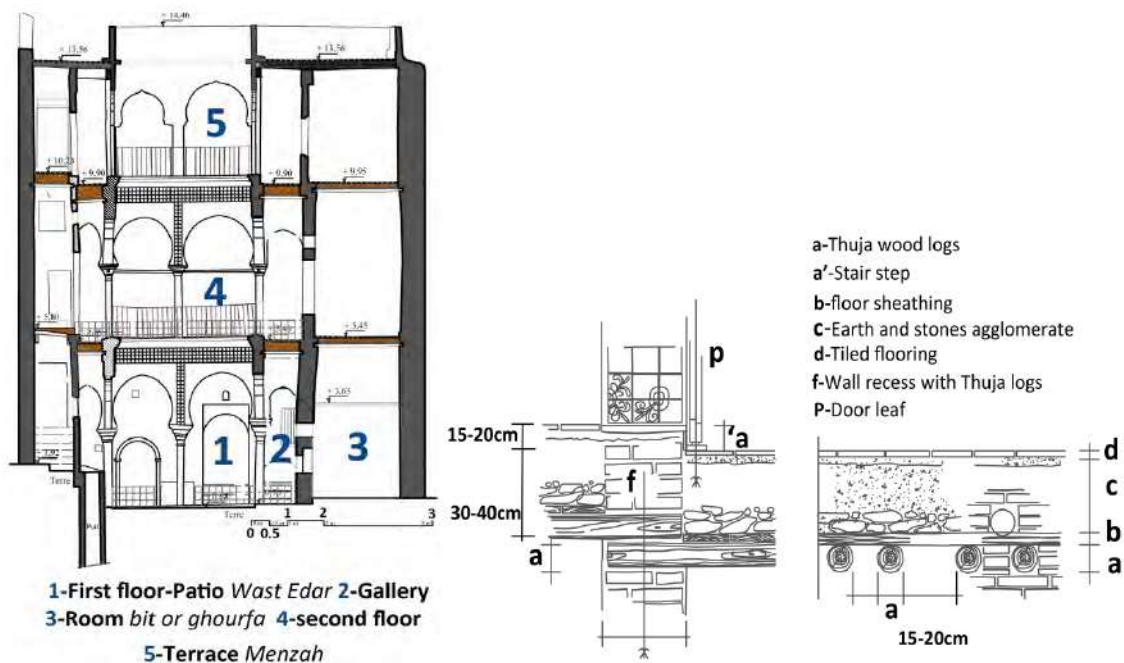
Left: Cross-section of a traditional house (Ali PACHA Agency). Right: Constructive system of ceilings/floors [9].
